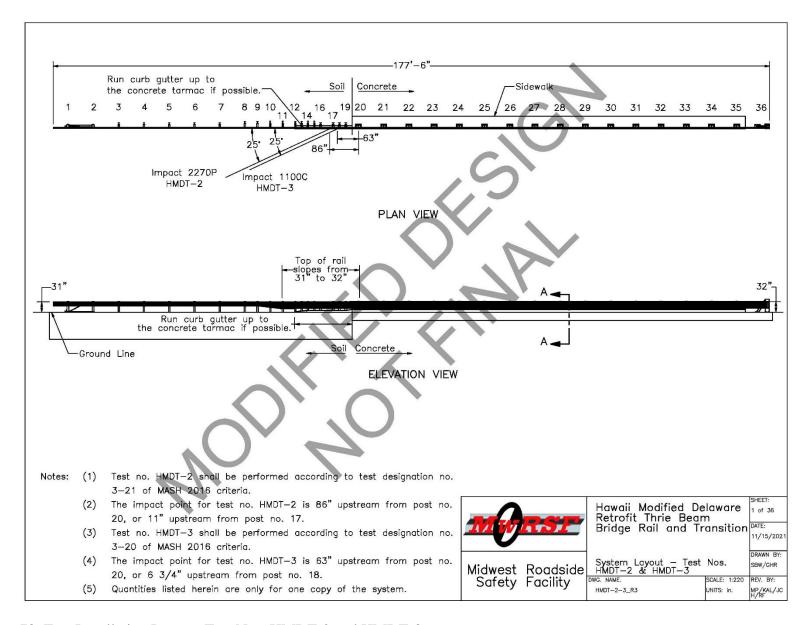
Test Installation Layout, Test Nos. HMDT-2 and HMDT-3
